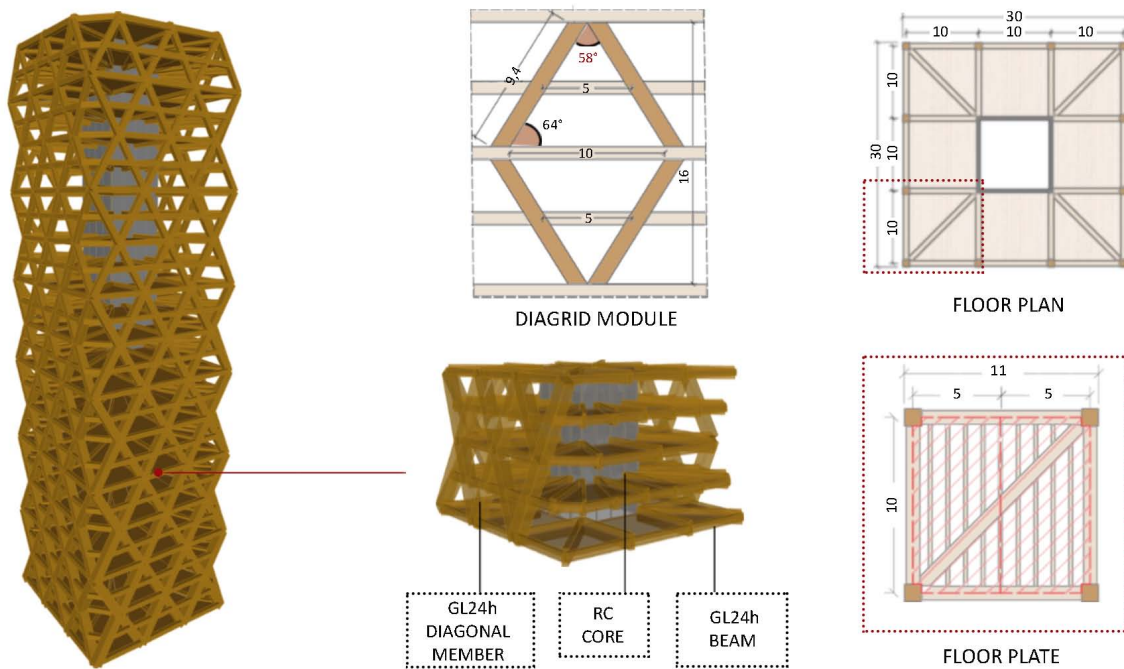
Schematic of the diagrid variant and typical floor plans.
